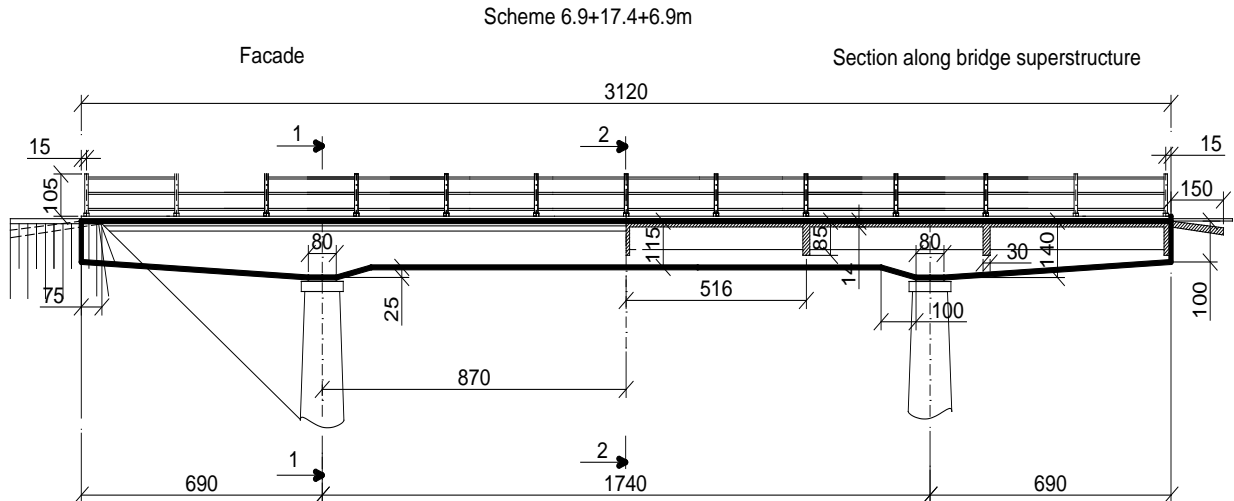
Facade and along section of road-bridge superstructure with double cantilever beams
